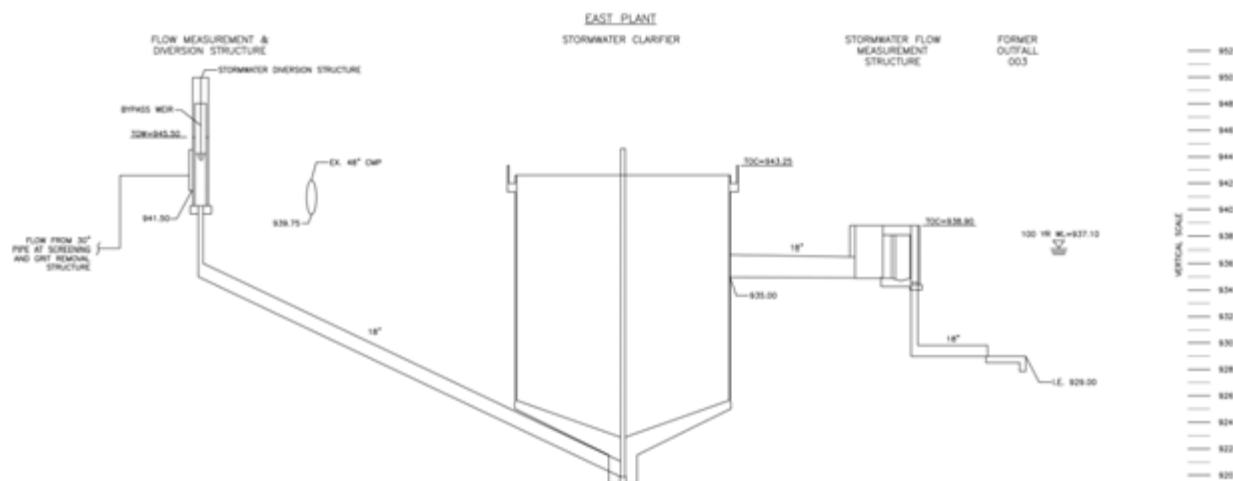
East Plant Wet Weather Hydraulic Profile: Headworks to Flow Diversion Structure
